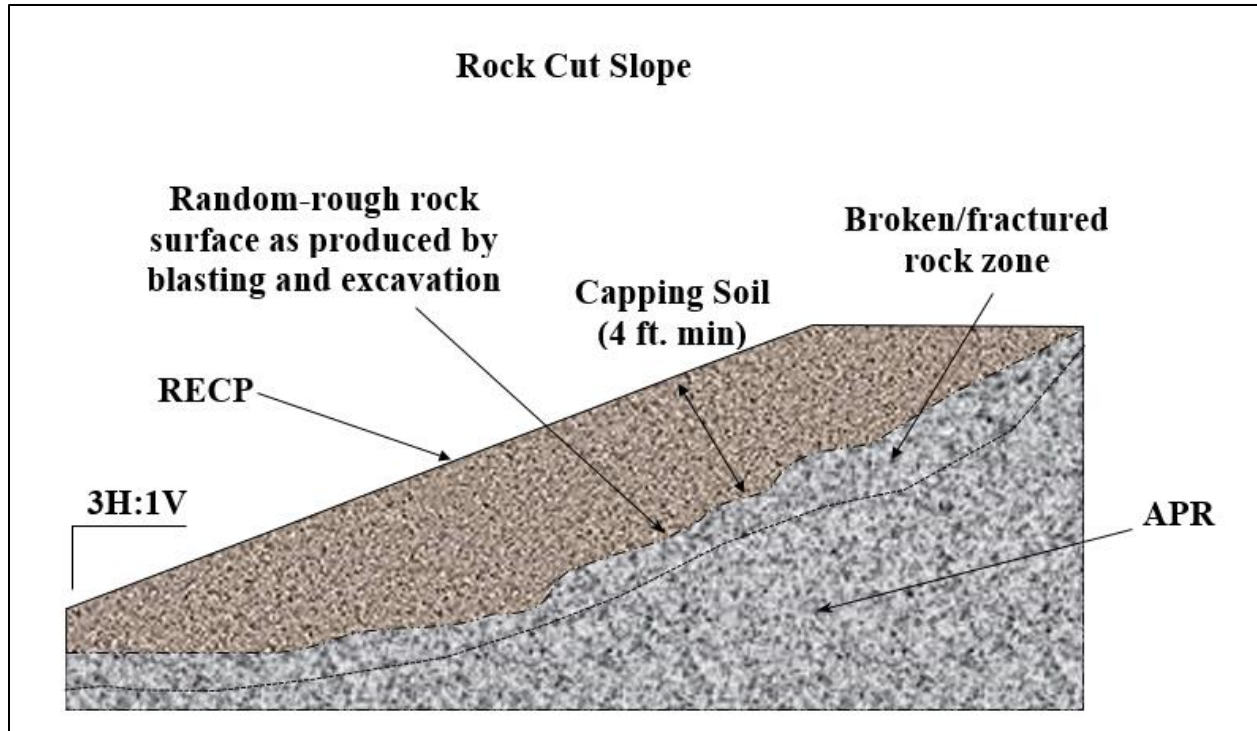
Typical Section: Minimum Requirements Rock Cut with Slope Face 3H:1V or flatter (Condition C)
